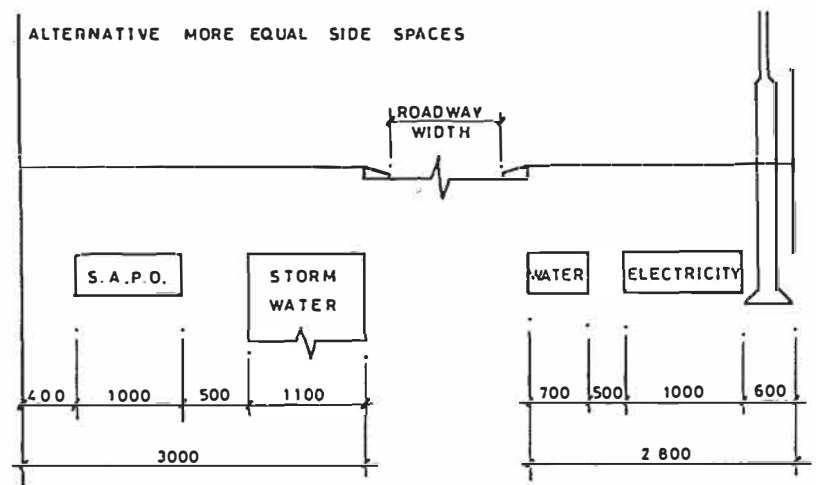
ROAD CROSS-SECTION SERVICES UNDER THE VERGES.
